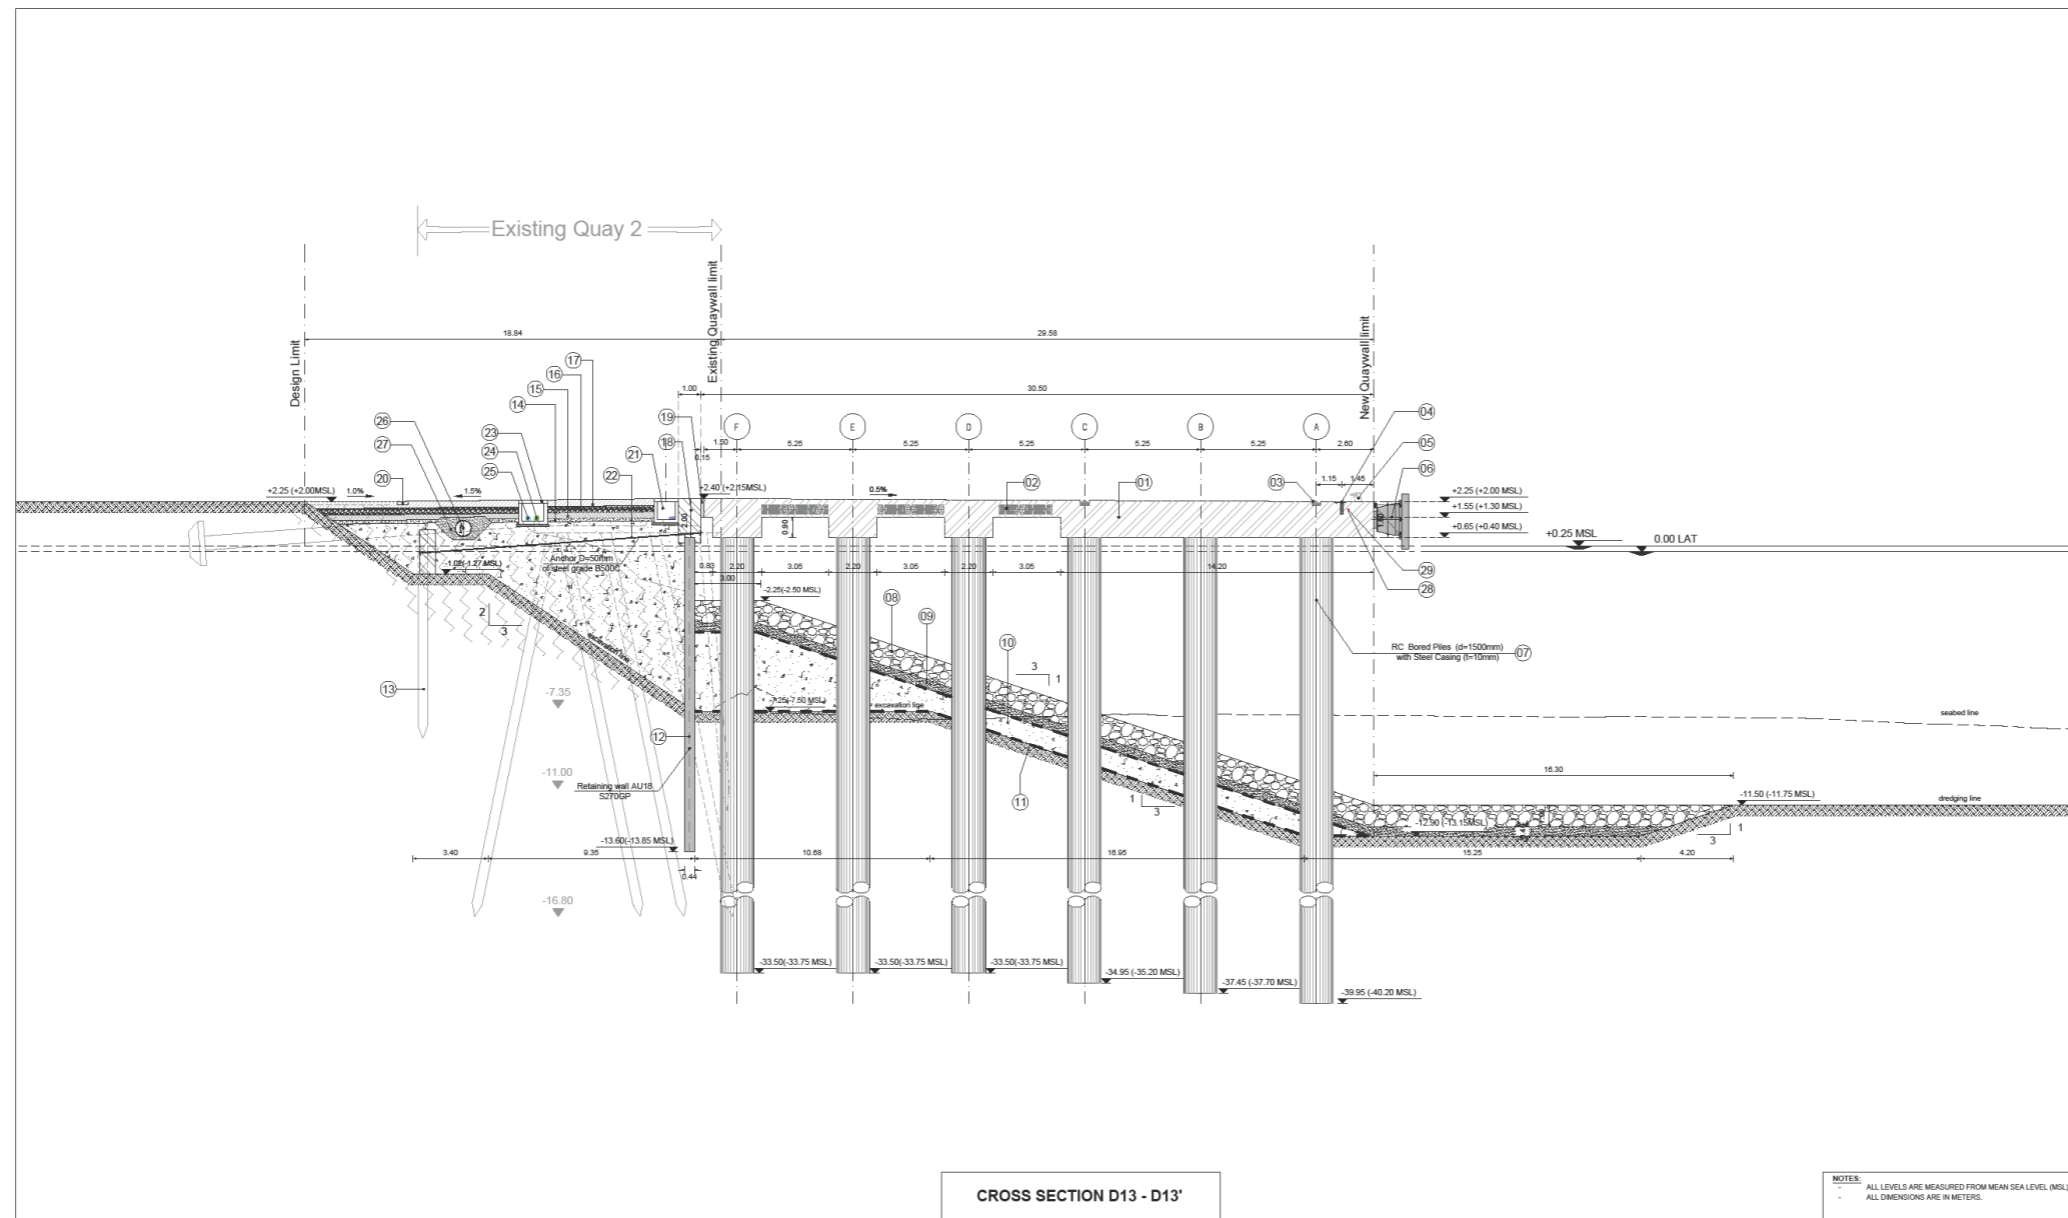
Cross Section D-13 of Quays nr.2 After Reconstruction
